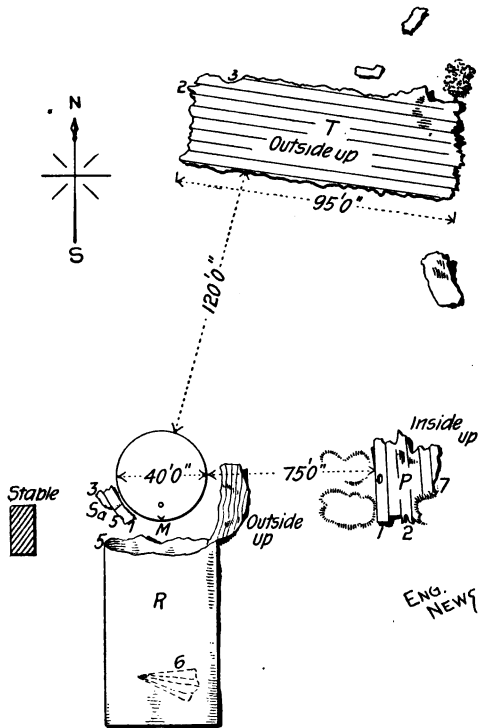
SKETCH PLAN OF WRECKED STAND-PIPE AT EAST PROVIDENCE, R. I.
